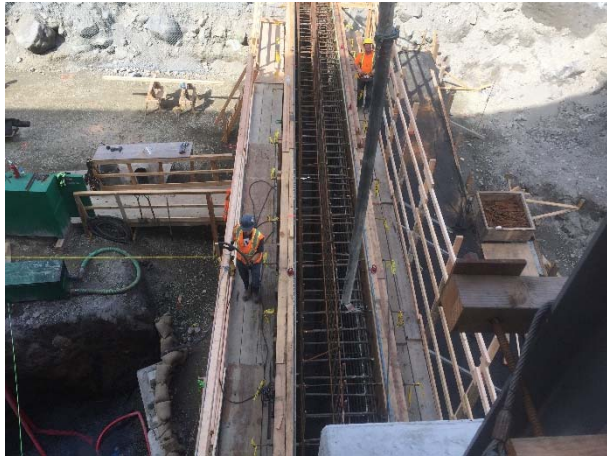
Concrete pour for the northwest wall of the ULRHEF tailrace (April 29, 2016).
